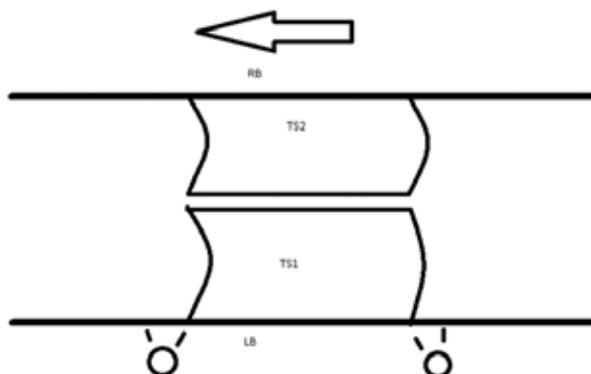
Site plan of Roxbourne Park Culvert 1
